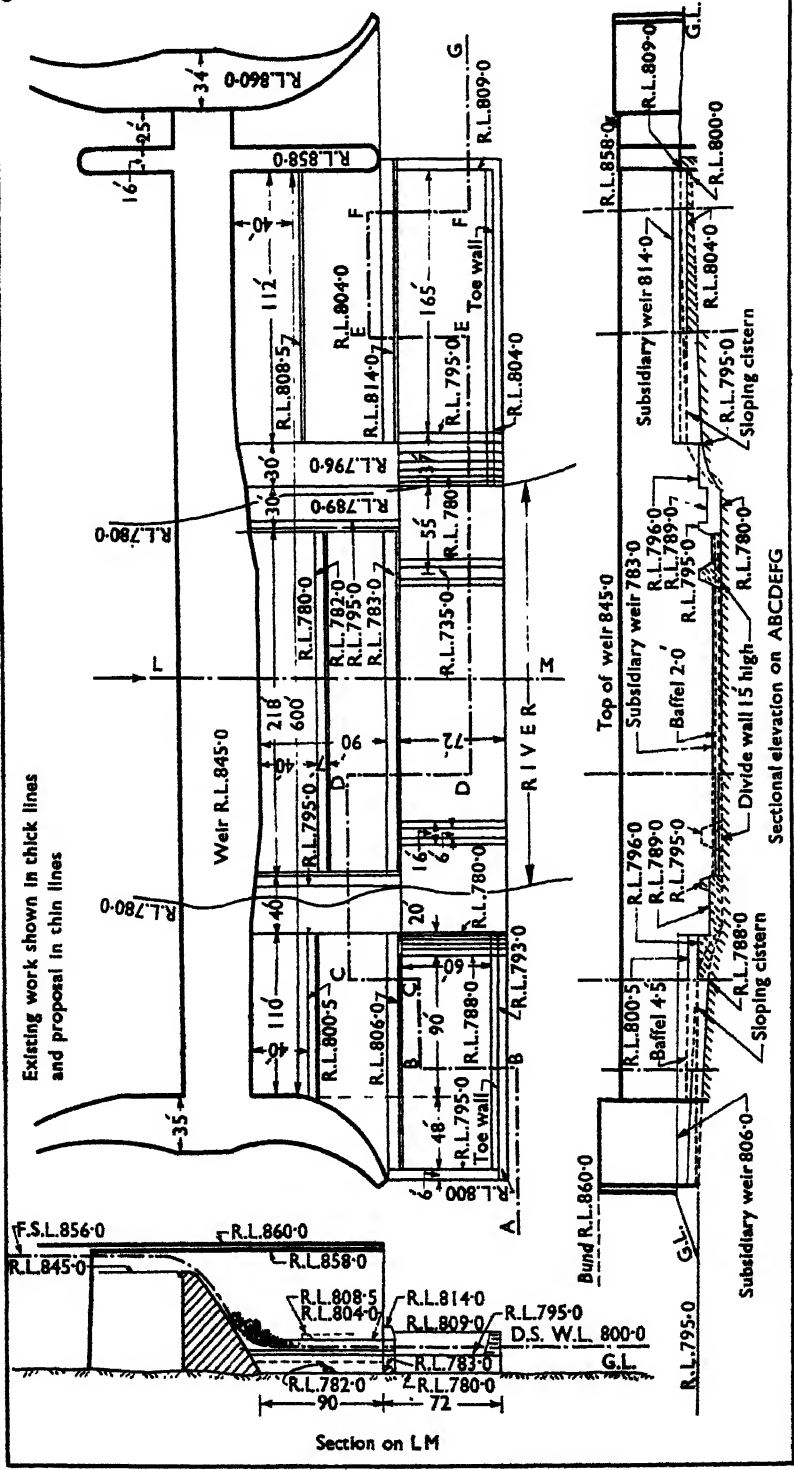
C.6:- Showing protection work downstream of Nagwa Weir
